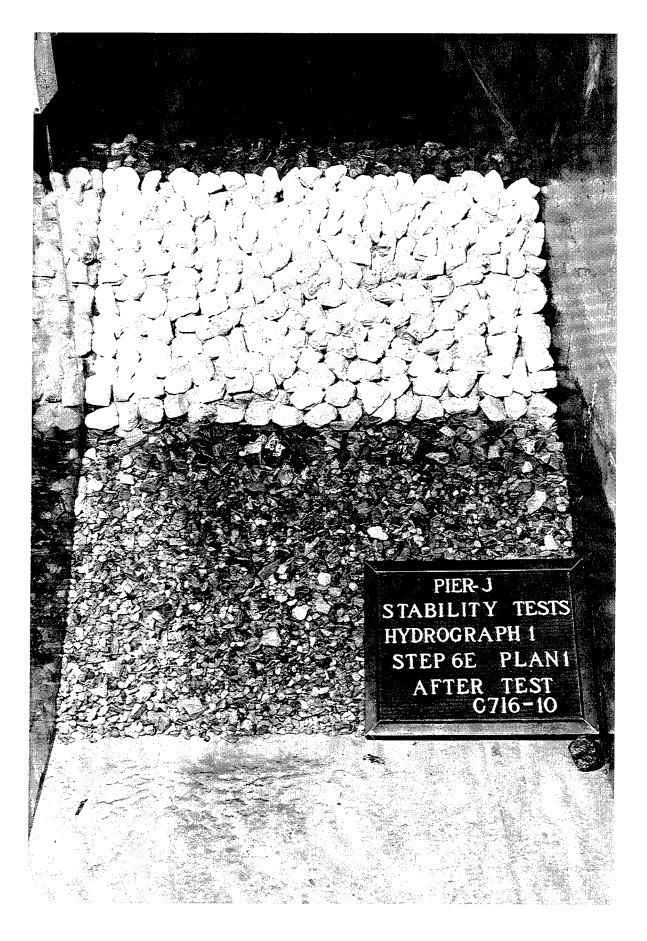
Harbor-side view of Plan 1 after testing step 6 of Hydrograph 1
